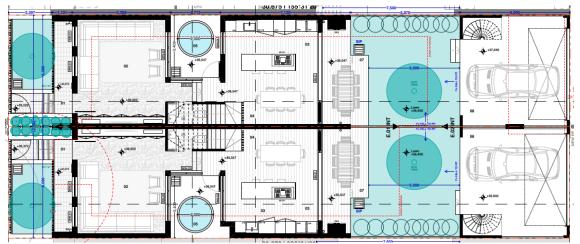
Ground floor plan of proposed development showing location of principal living area and principal area of private open space.
